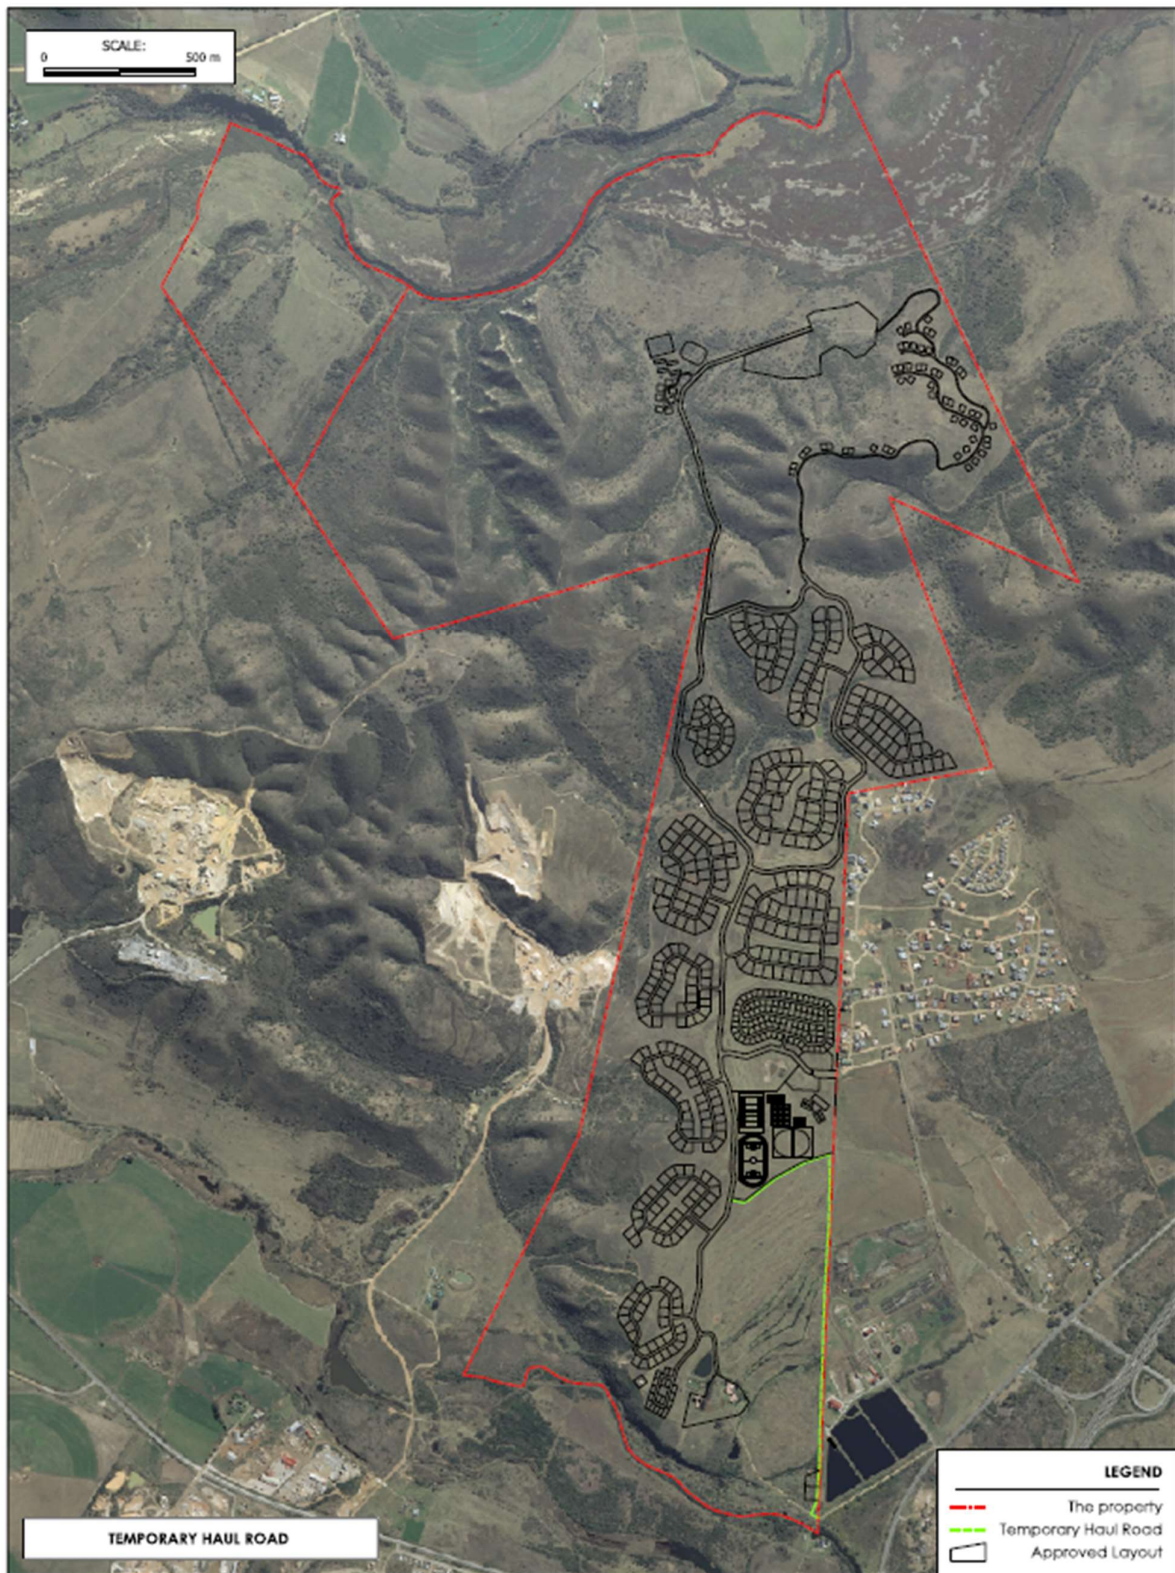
SITE DEVELOPMENT PLAN AERIAL OVERLAY
